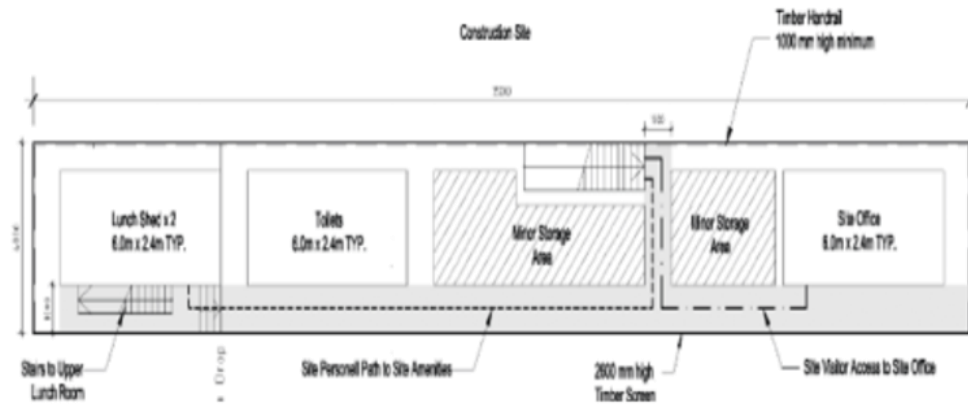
Typical Site Plan for Type B hoarding with Site Sheds
